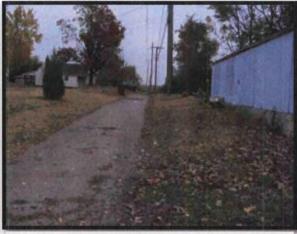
Alley (gravel) between Oriole Street and Klein Avenue (view south).
